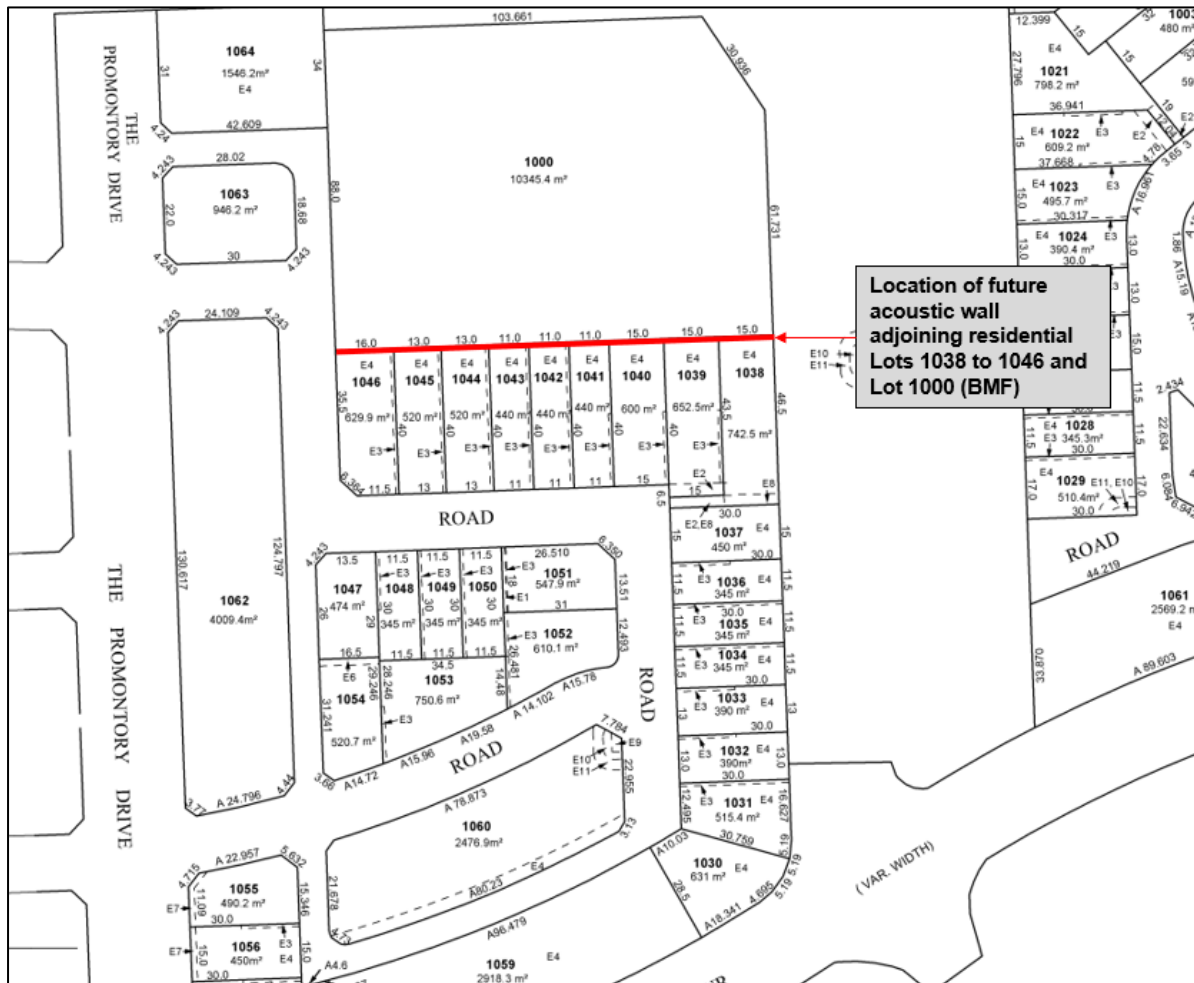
Location of future acoustic wall adjoining Lots 1038 to 1046 in Precinct A (Source: Subdivision Plan for DA619/2017)
